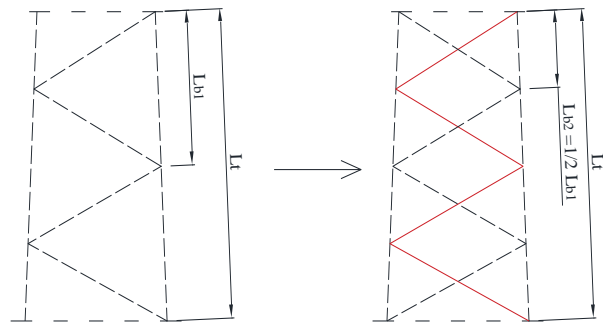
Reinforcement scheme of a tower with a single bracing pattern – additional diagonal braces mirroring the original bracing pattern
